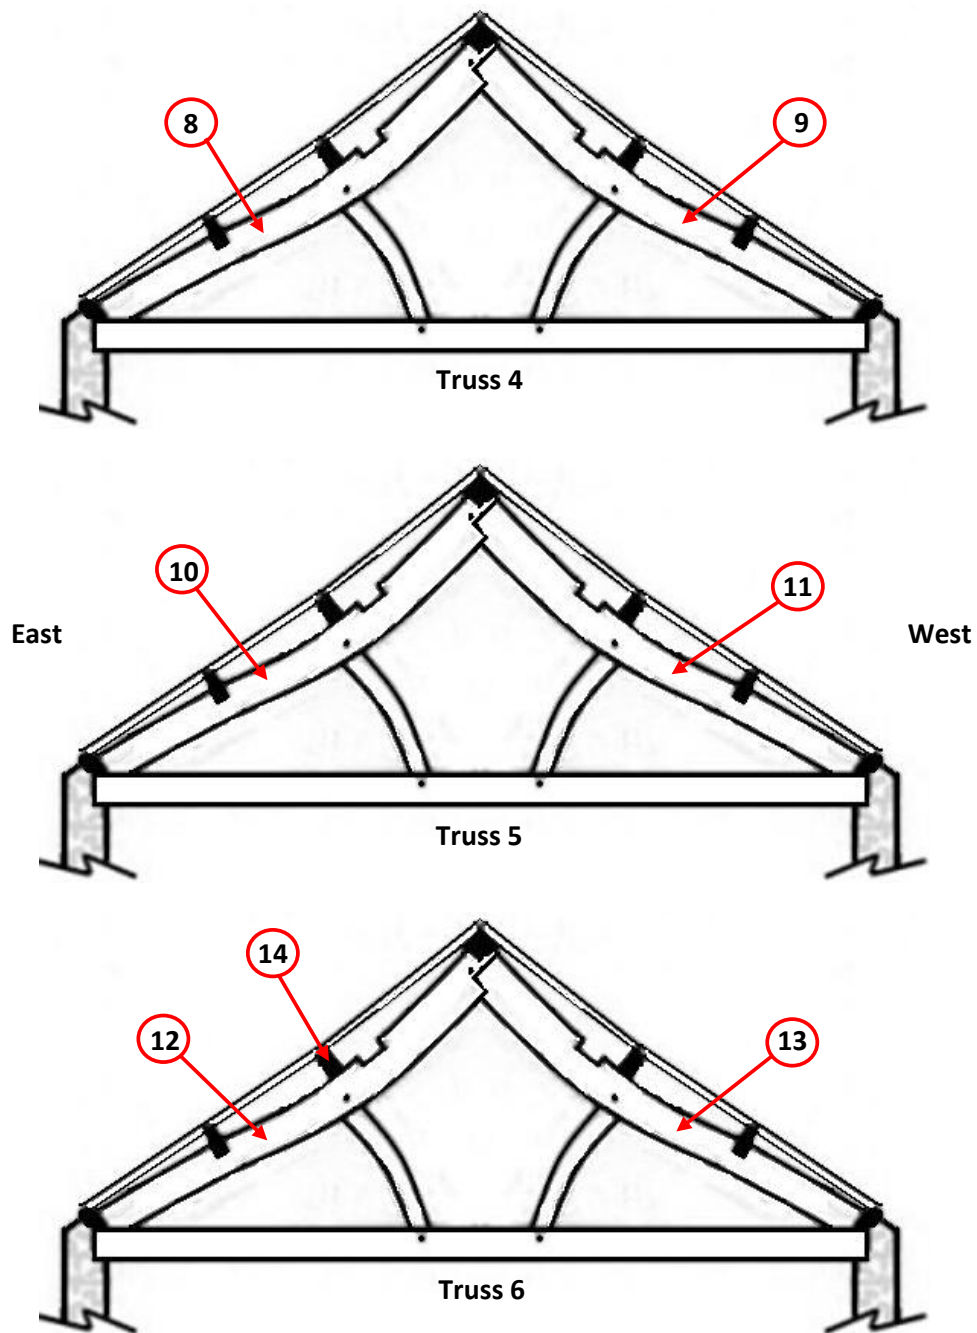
f: Sections through the rear range roof to help locate sampled timbers (see Table 1) (after Cumbria Vernacular Buildings Group survey)
